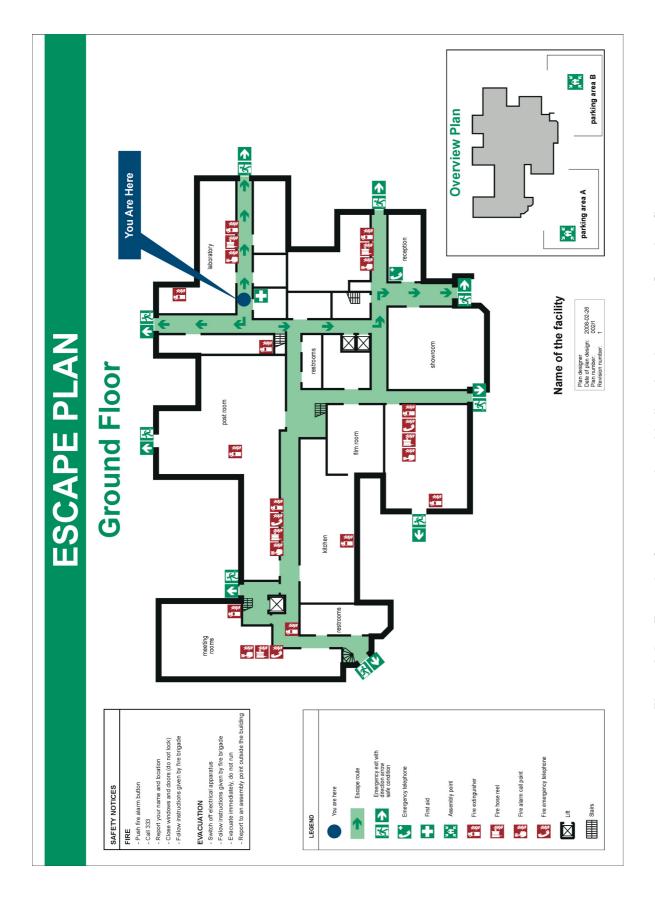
Example of an escape plan with directional arrows — Complete floor
